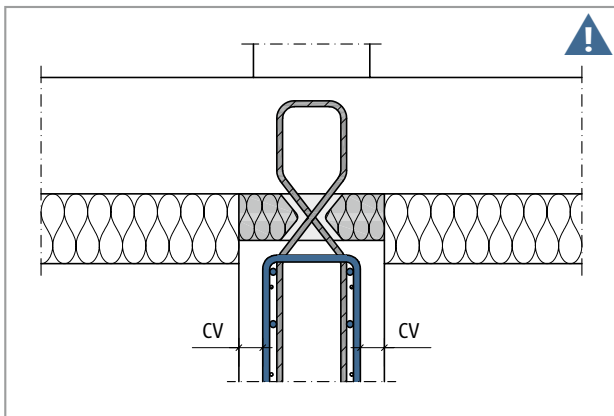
Schöck Sconnex® type W-N-VH: Variant A – on-site reinforcement; the outer longitudinal reinforcement supports the shear force bars of the Schöck Sconnex® against the structural element surface
